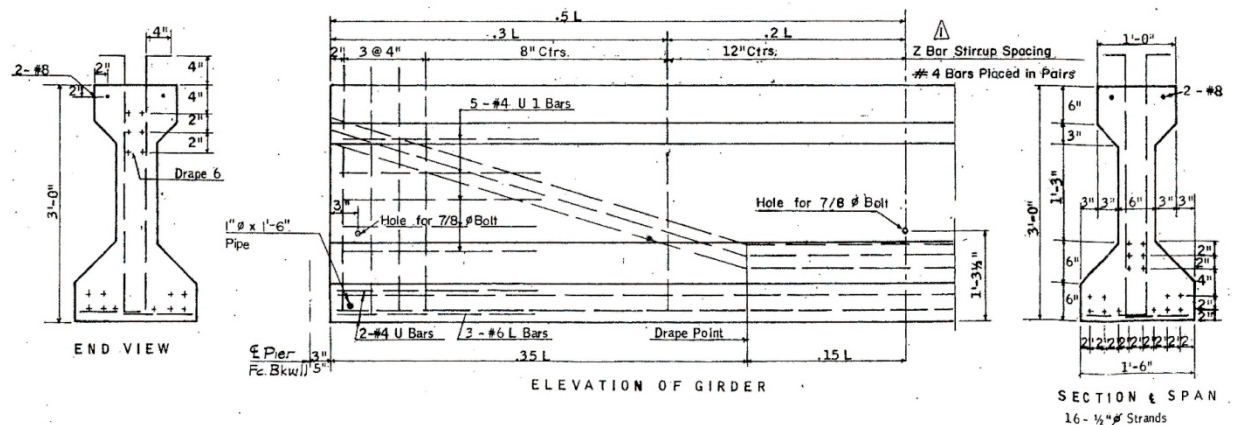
Elevation and details of the selected I-244 Bridge girder (ODOT [2006]).
